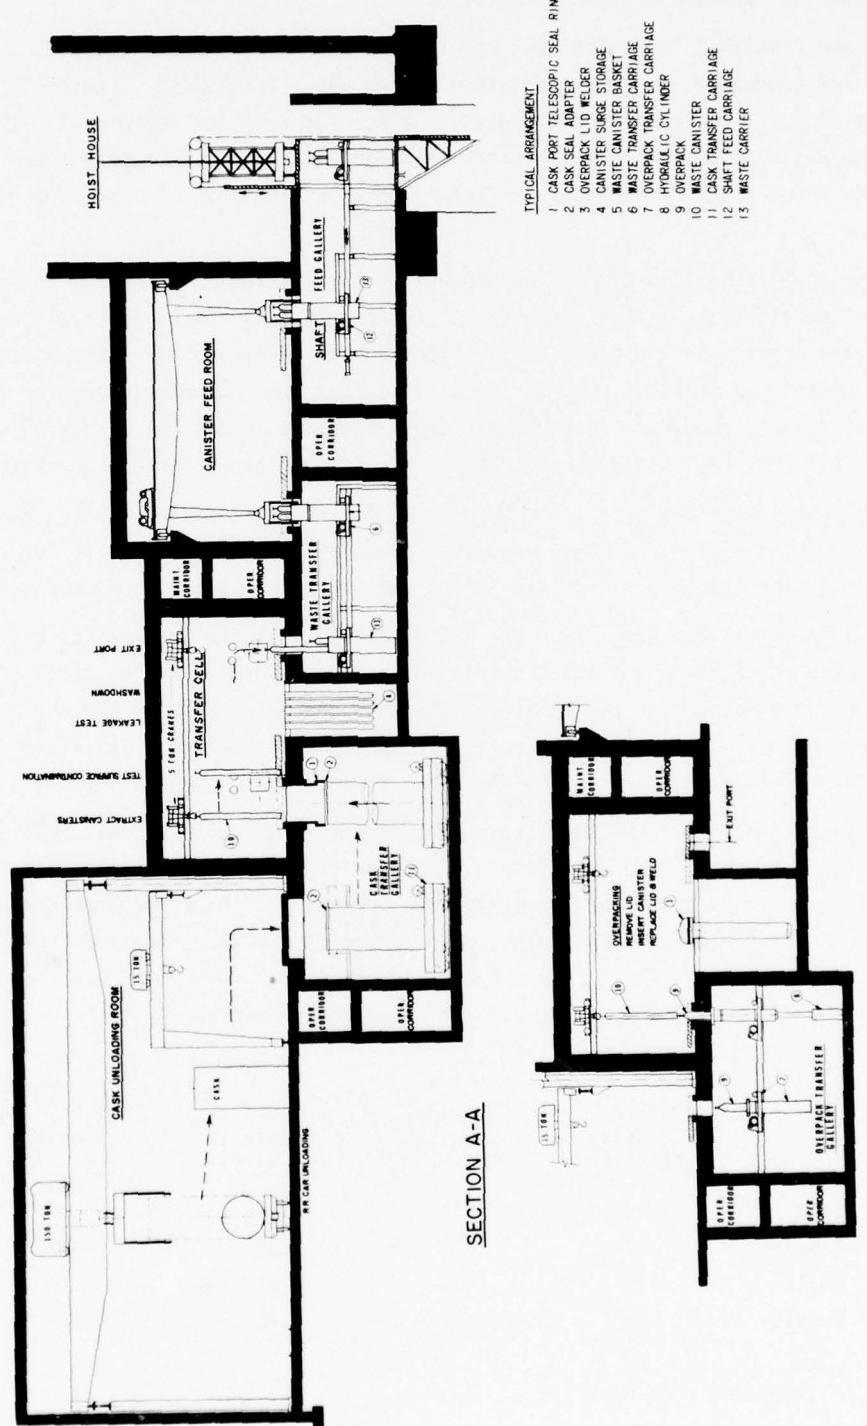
Canistered Waste Building Section Views, Once-Through Fuel Cycle, Repository in Salt
